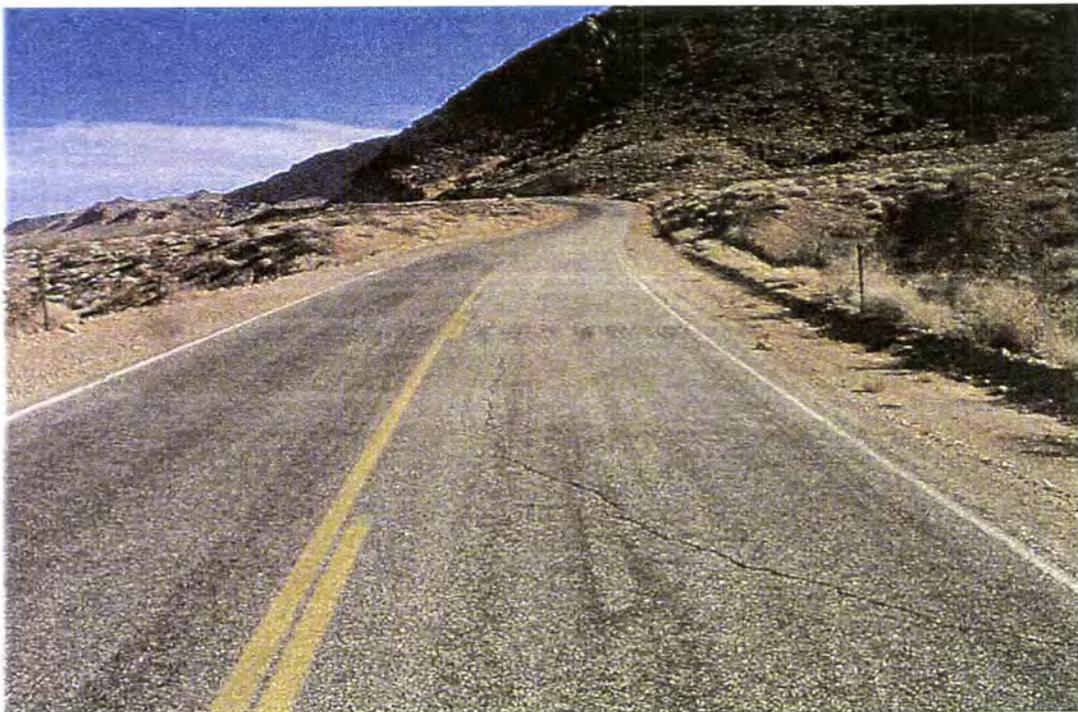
MP 21.40 - Parking Area Left (Rte 968)
